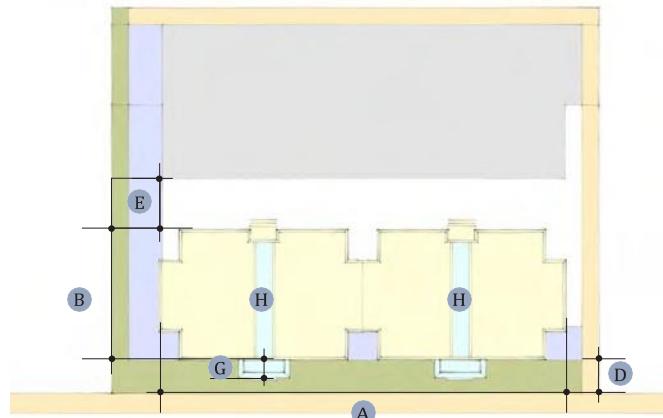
Example of Single-Aspect Walk-Up Multiple-Family Building
